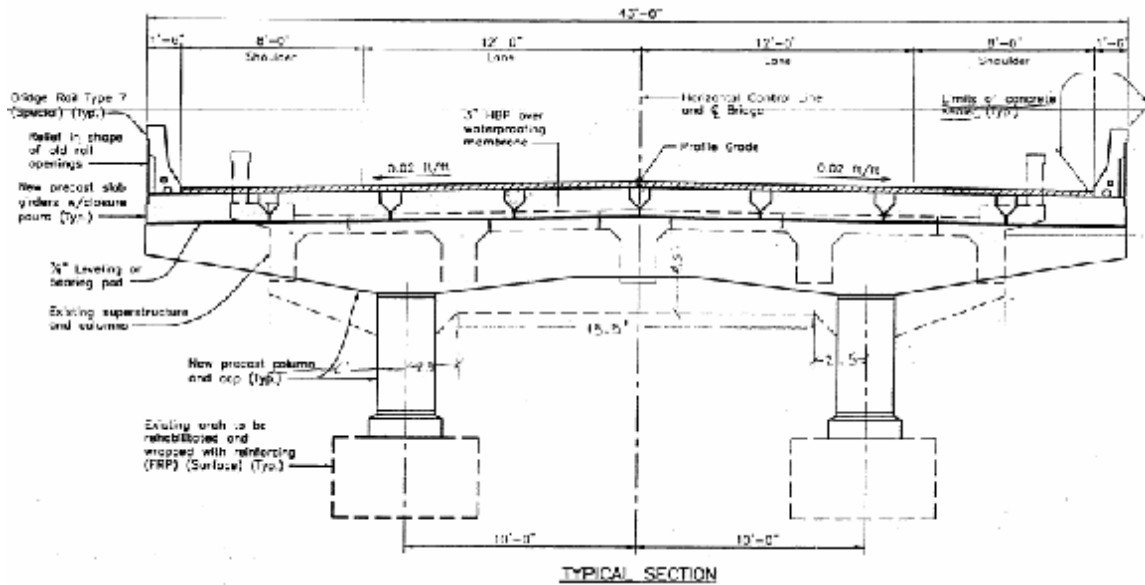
Cross section of the Castlewood Canyon Bridge
